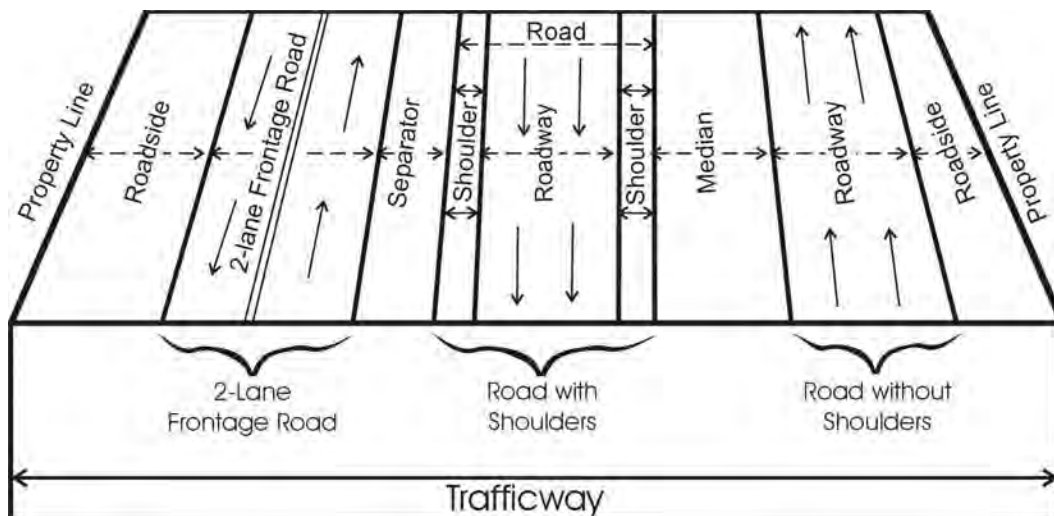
Trafficway with Frontage Road (See 2.2.1, 2.2.28-2.2.33)
